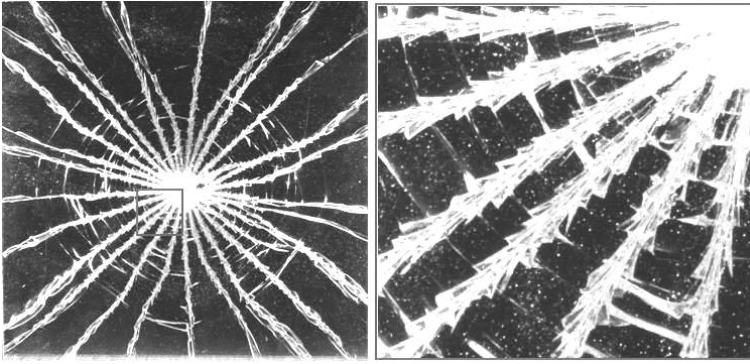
Fracture pattern for specimen I7_6 (left) and detailed view (right).
